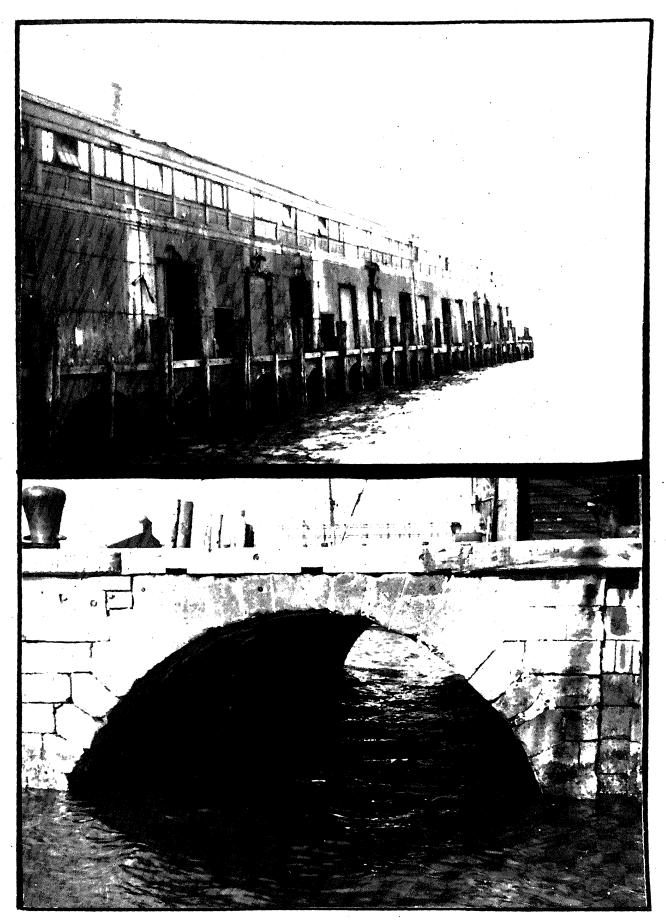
Block and bridge type pier, Pier 1, North River,
